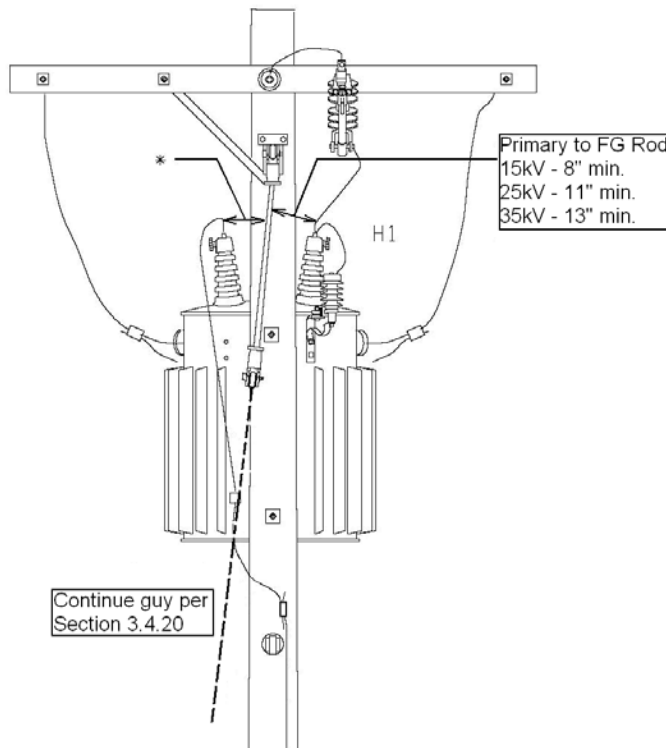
Guy Wire Clearances (Using Table 8 Clearances)
